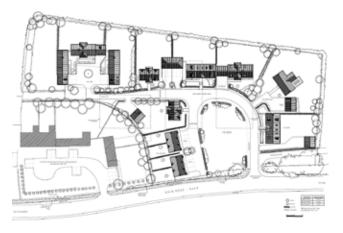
Site plan of Southside Close, showing the layout of the development which draws from traditional farmstead principles. (Fowler Architecture and Planning)
